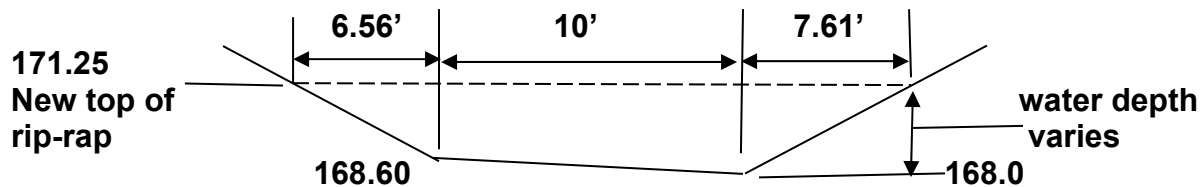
Revised Cross-Section, Drainage Channel Section One, 95' south, Looking North
